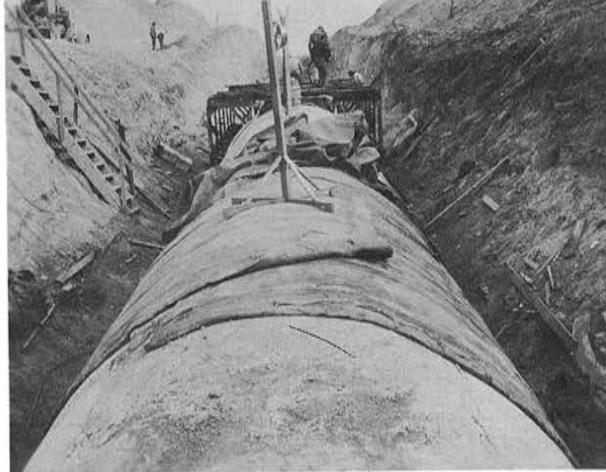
Rock wool insulation blankets were placed directly on exterior concrete surface of Courtland Canal siphon barrels. Metal slip forms were covered for 12 hours prior to stripping while concrete hardened. Note insulation blankets over steel cage ahead of forms to protect subgrade that is ready for concrete placement.
